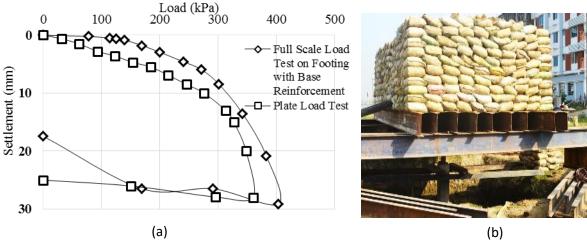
(a) Load - settlement curve and (b) field load test arrangement
